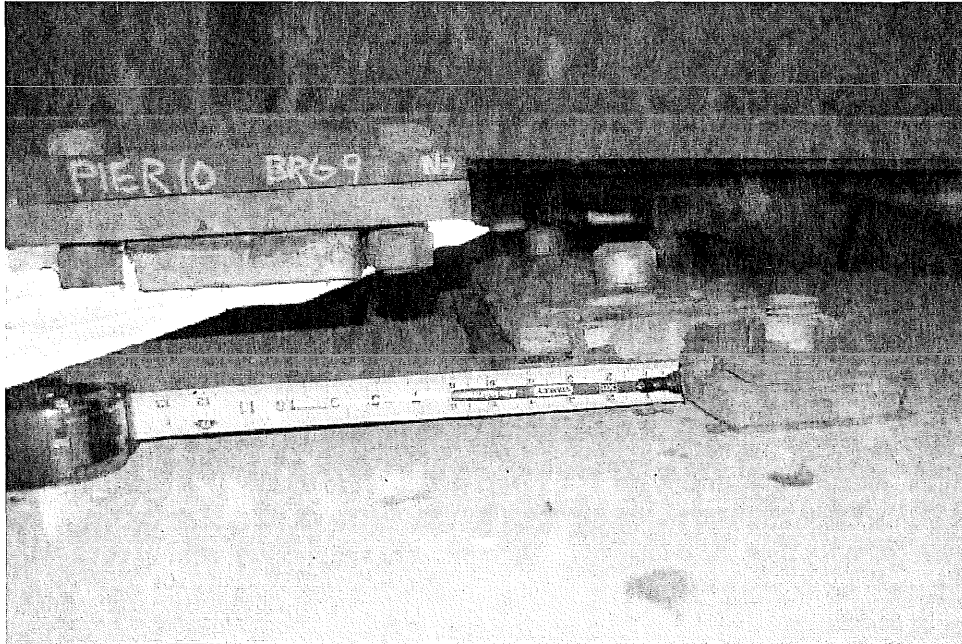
Translation and uplift of upper bearing plate at Pier 10, looking west.
